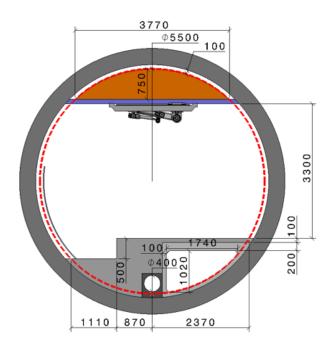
Typical FCC tunnel cross section. (Fani Valchkova-Georgieva, CERN)
